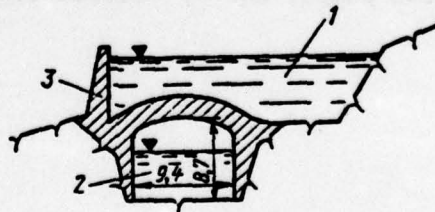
Unwatering of the construction site using a channel-conduit system during building of the Serebryanskaya Hydroelectric Power Station.
